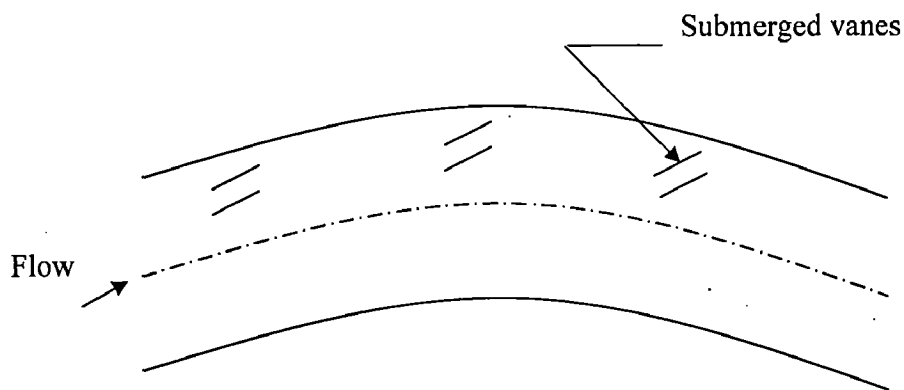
Layout of submerged vane as Anti bank erosion structure
